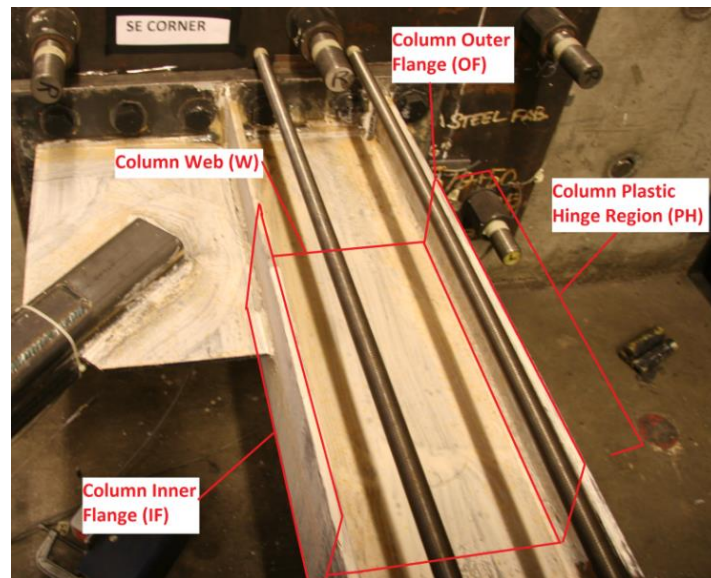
Nomenclature for column damage locations (Terpstra 2017)
